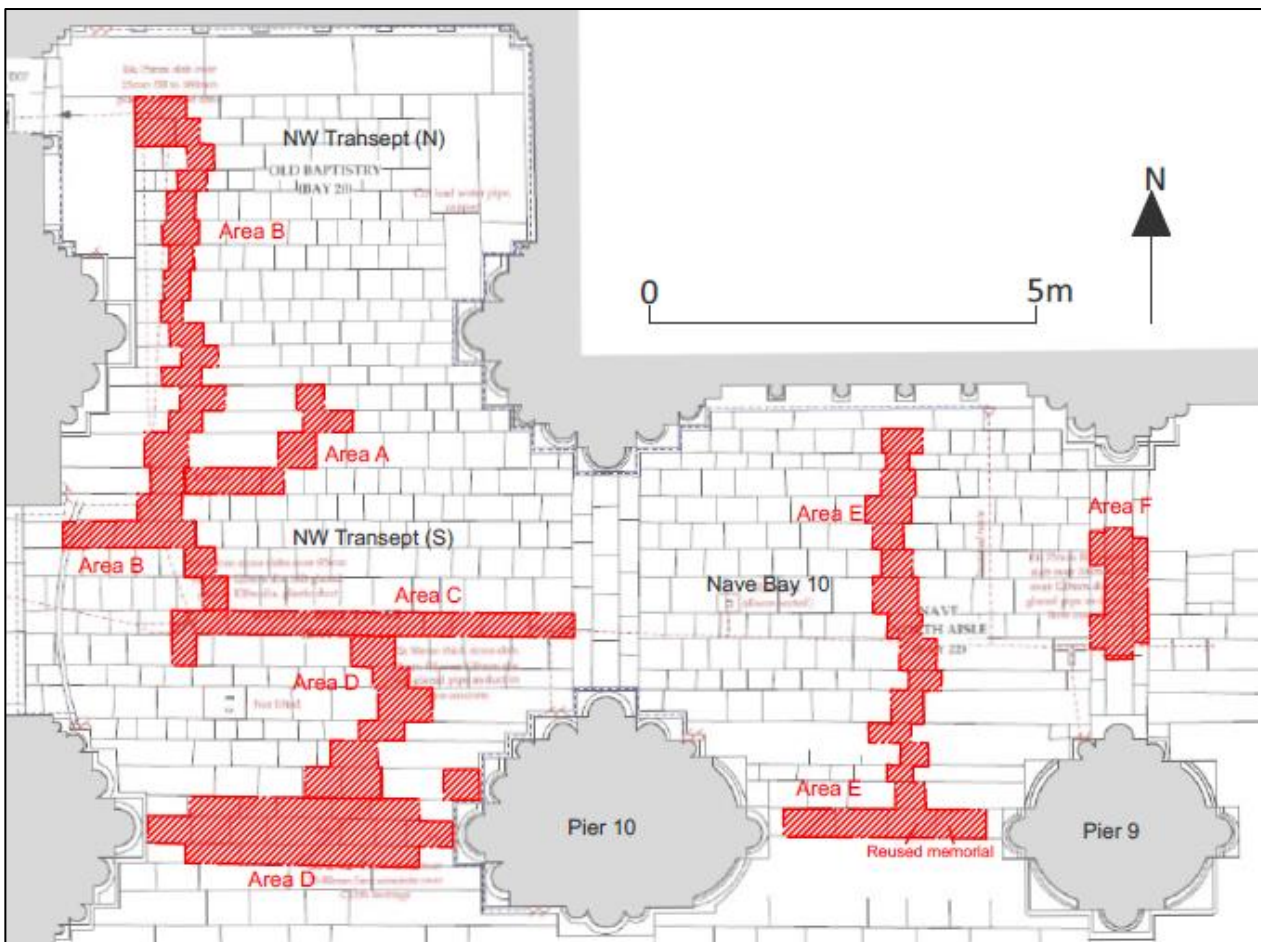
North-west transept and west bay of nave north aisle, showing areas of excavation for services and gates marked up on pdf of architect's plan
